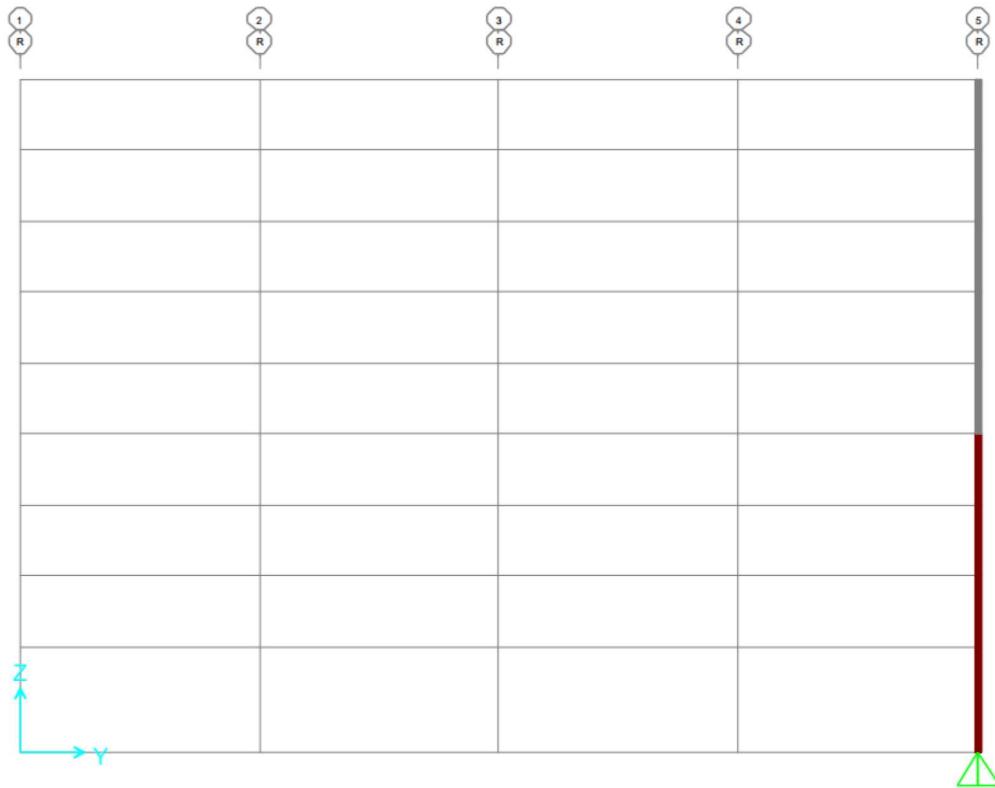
Column cross-section layout in the face R (SAP2000)
